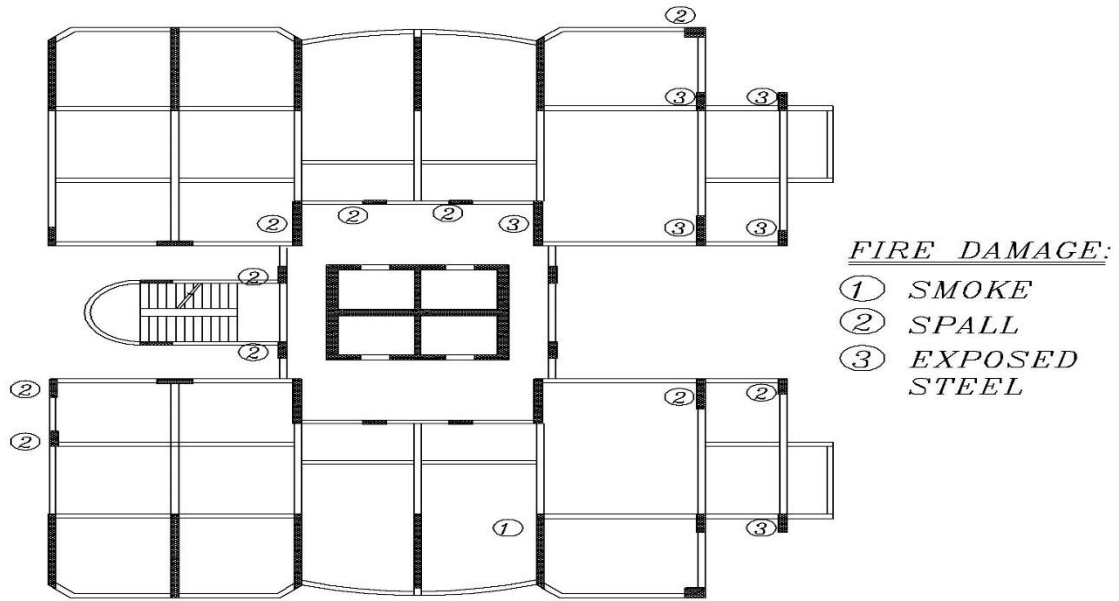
fire damage to 8<sup>th</sup> floor RC. columns/walls zone1
